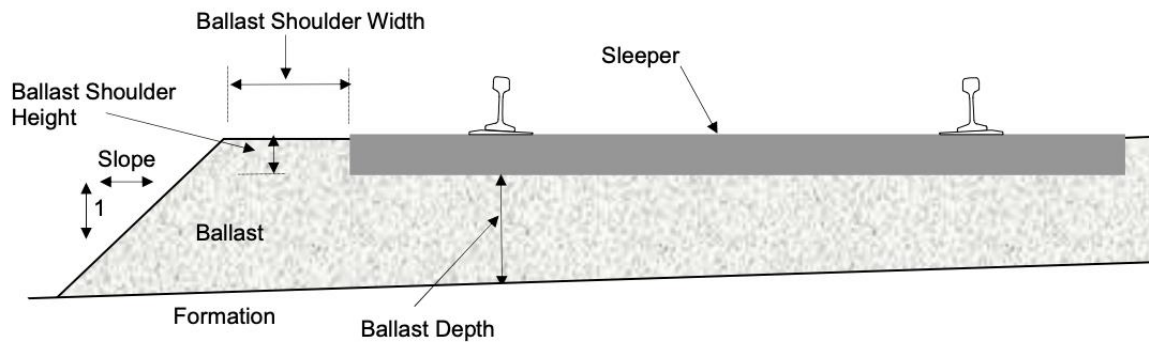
Typical track cross-section and ballast profile (RailCorp, 2015)
